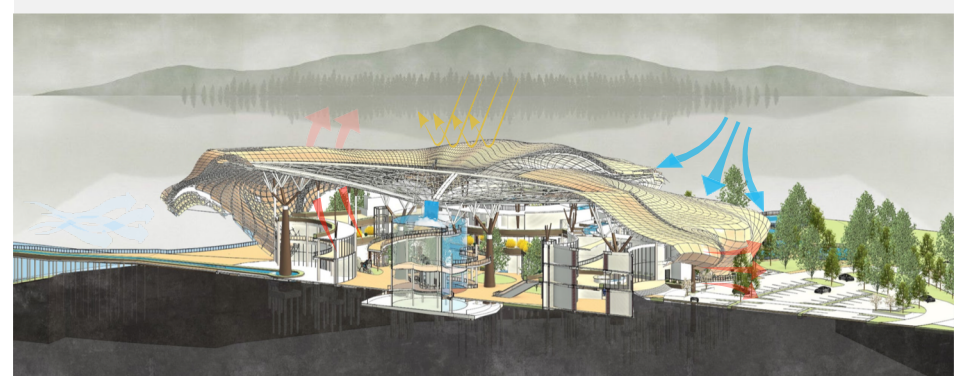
Sectional Perspective of the Freshwater Fisheries Research and Discovery Centre showing cold wind enter the building from large opening and hot air going out the building
